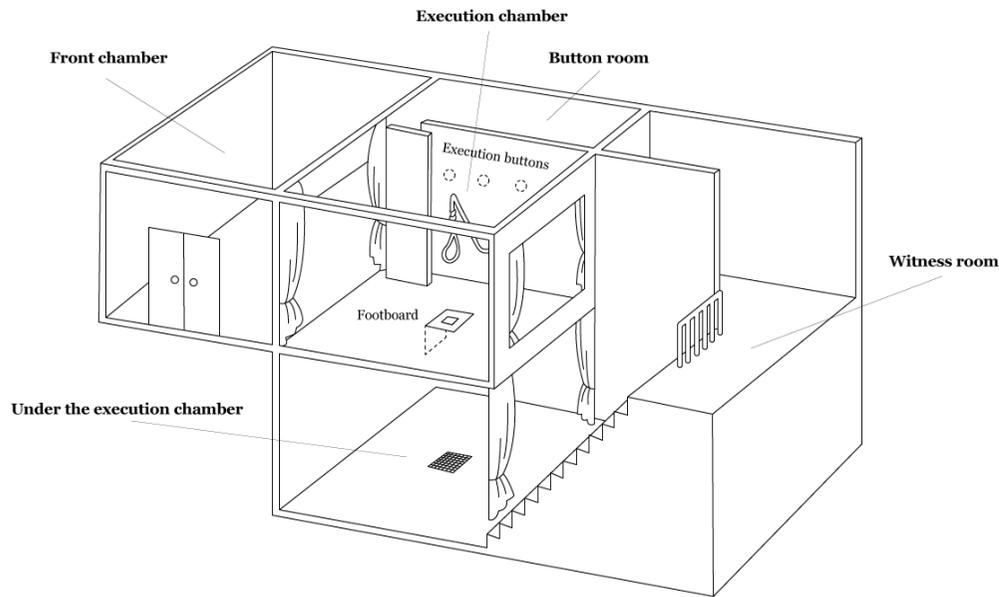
Execution chamber in the Tokyo detention house (3D view) ¹⁸
